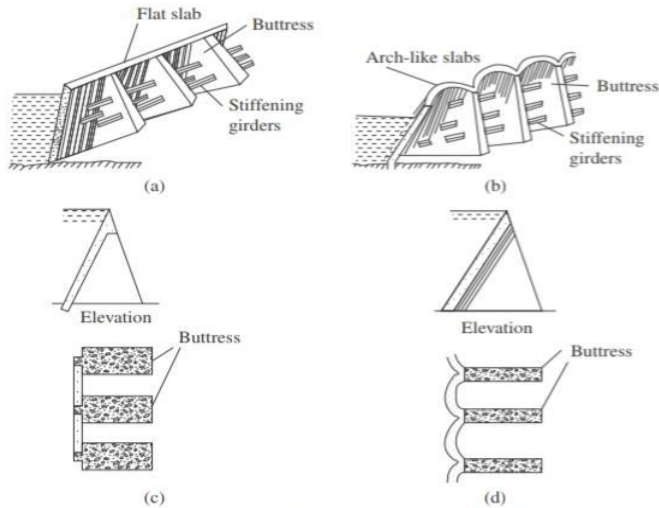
Buttress dam: (a) three-dimensional view of flat slab type dam; (b) three-dimensional view of arch type dam; (c) elevation and section of flat slab type dam; and (d) elevation and section of arch type dam
